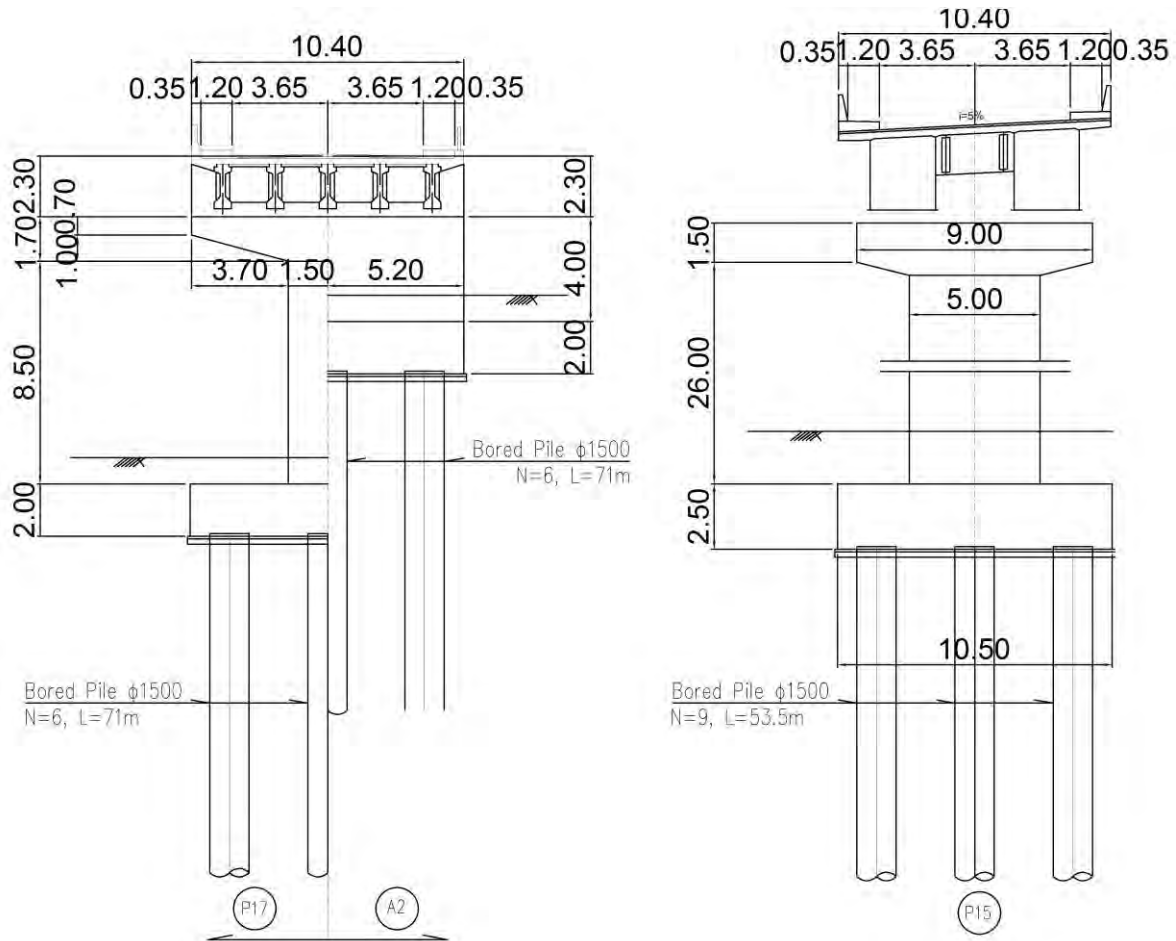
Cross-section of PC-I Girder for Approach Bridge
